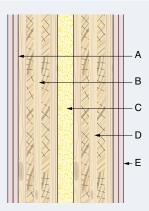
Typical fire-rated lightweight timber-framed wall systems for Class 2 mid-rise buildings.
